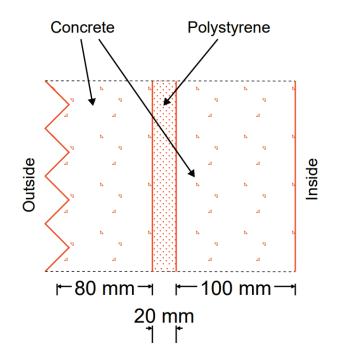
Sandwich construction of external wall panels, including approximate dimensions.
